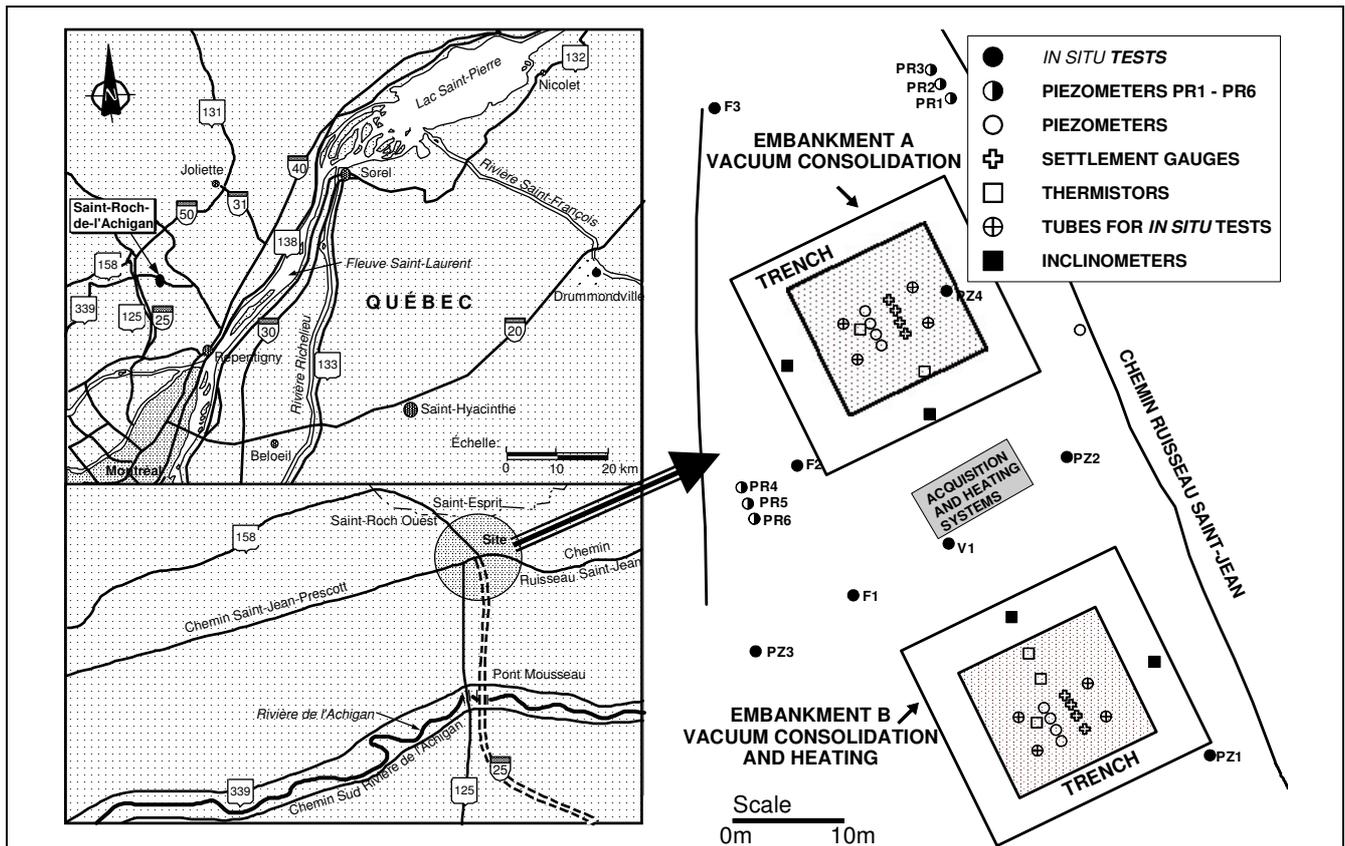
Localization and layout of Saint-Roch-de-l'Achigan site.
